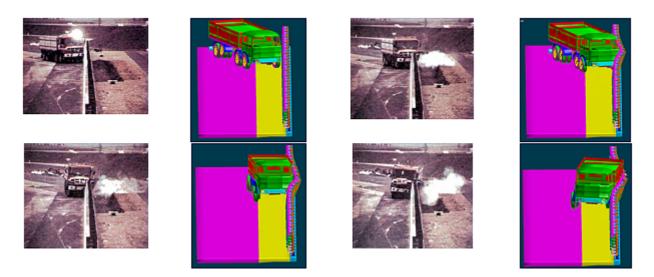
Validation of the heavy vehicle with a steel bridge barrier.
